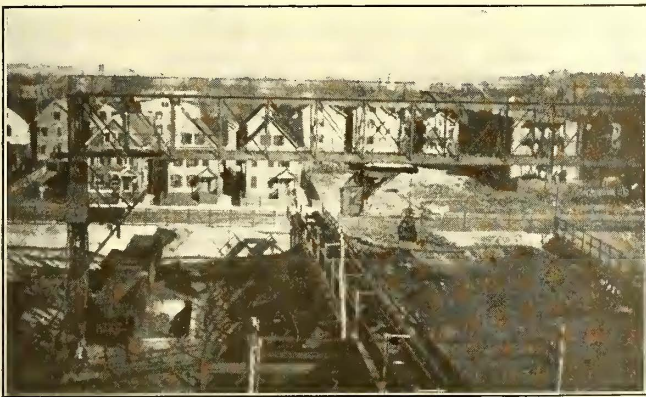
THE TRAVELING BRIDGE WITH TRESTLE CAR TRACK UNDERNEATH AND CAR DUMP PIT AT LEFT
